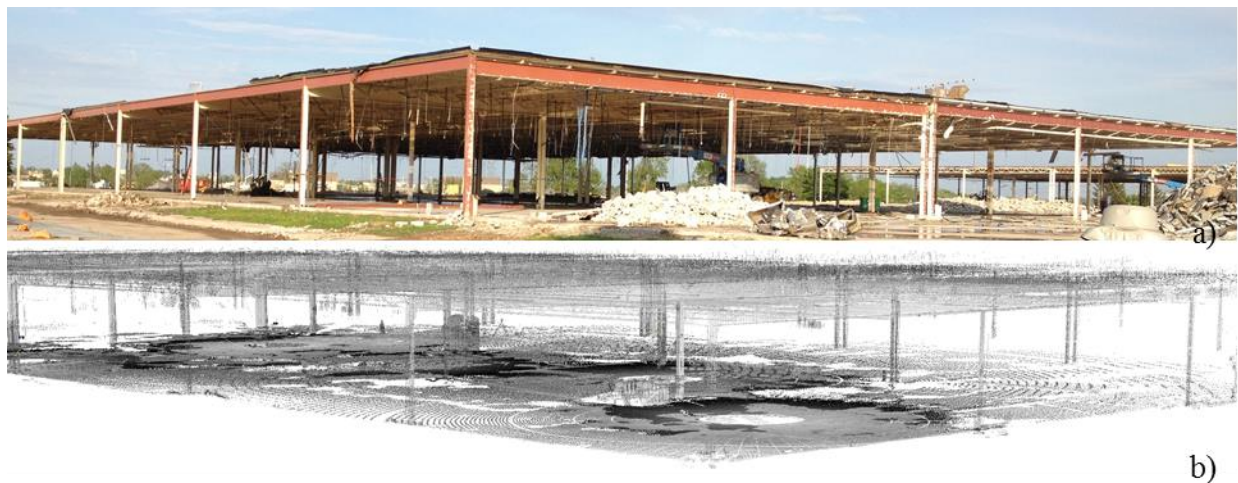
Photograph (a) and 3D point cloud (b) of a low-rise structural steel building
